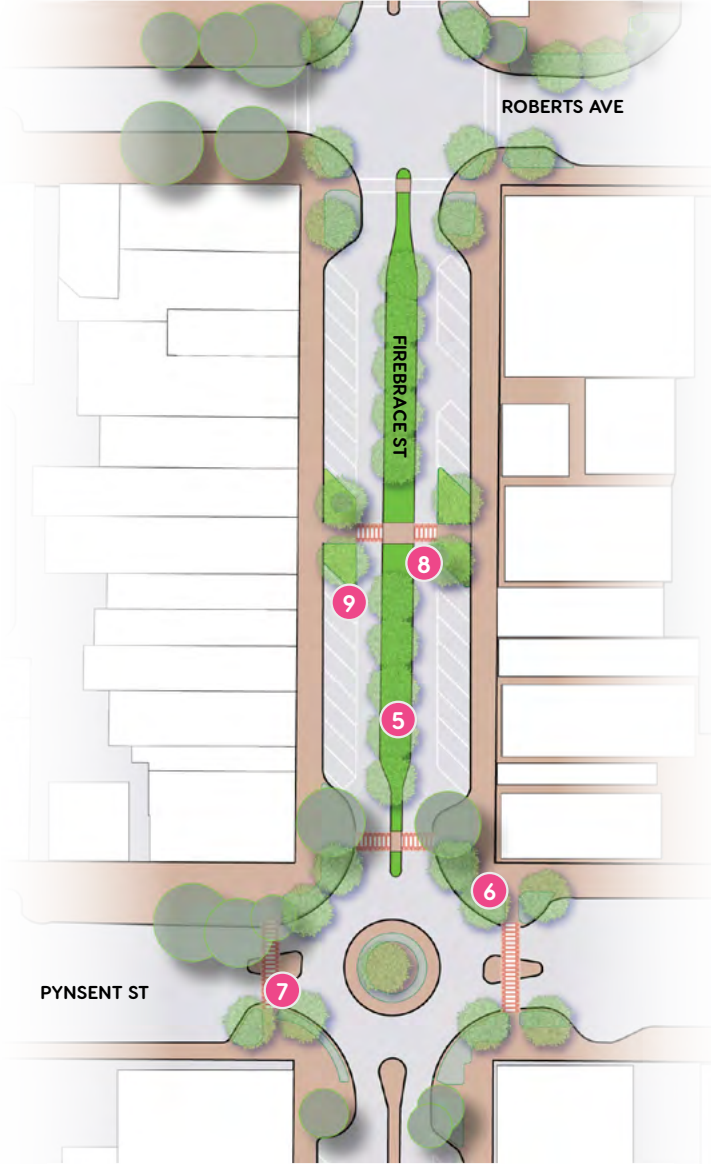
Proposed upgrades - typical block on Firebrace Street between Roberts Avenue and Pynsent Street
